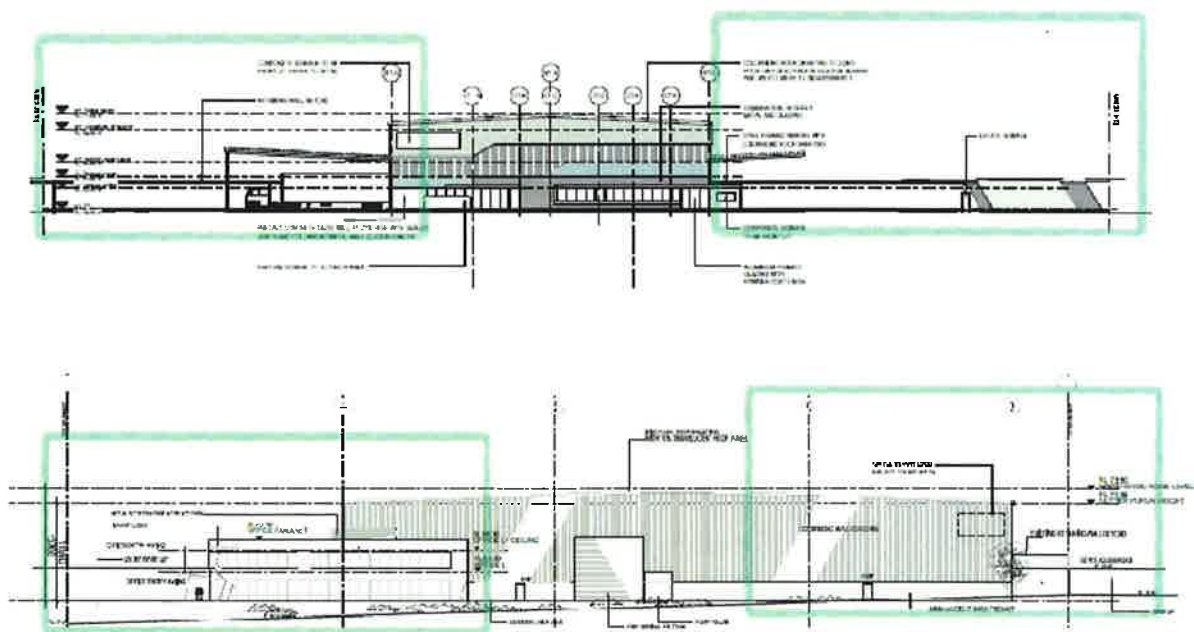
Comparison between the approved (top) and proposed (bottom) Southern Site Elevations
